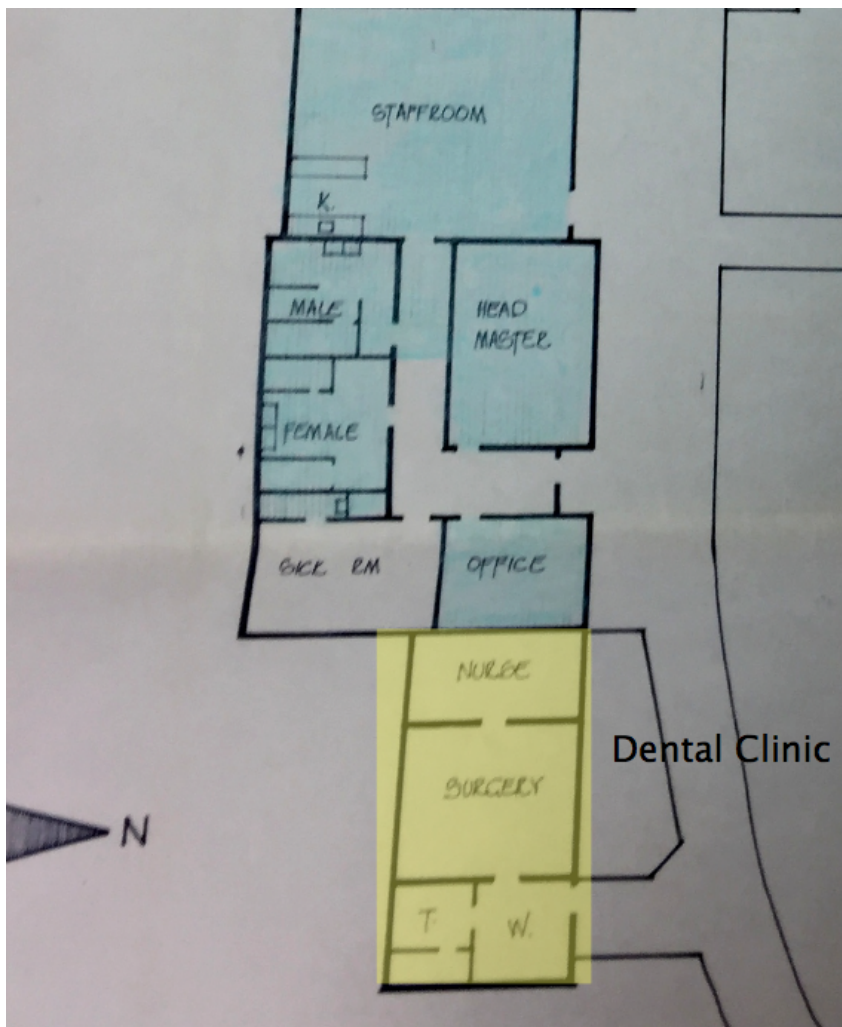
Building Plan showing Dental Clinic. (Source: Archived Documents Mt Pleasant School, 1970)
